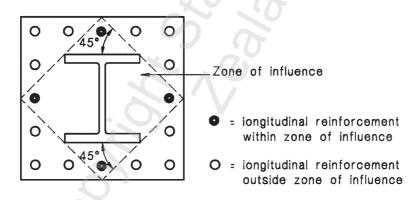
Zone of influence of steel section in an encased composite column
